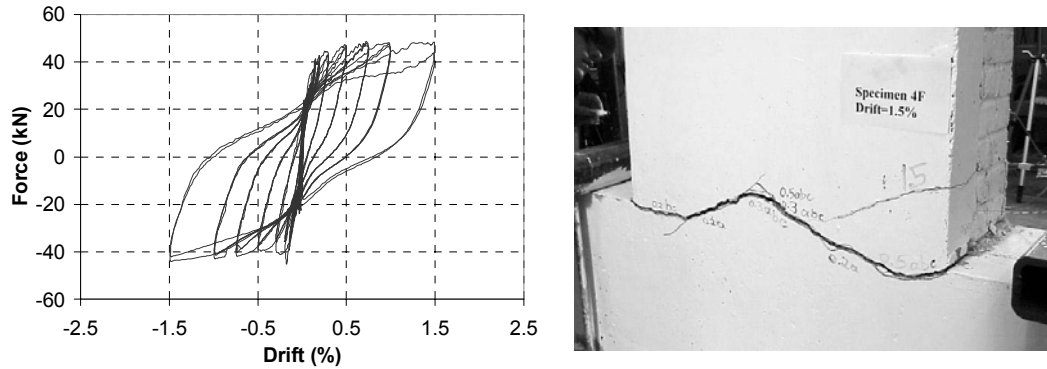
Force-drift plot and final damage photo for shotcrete rehabilitated pier
